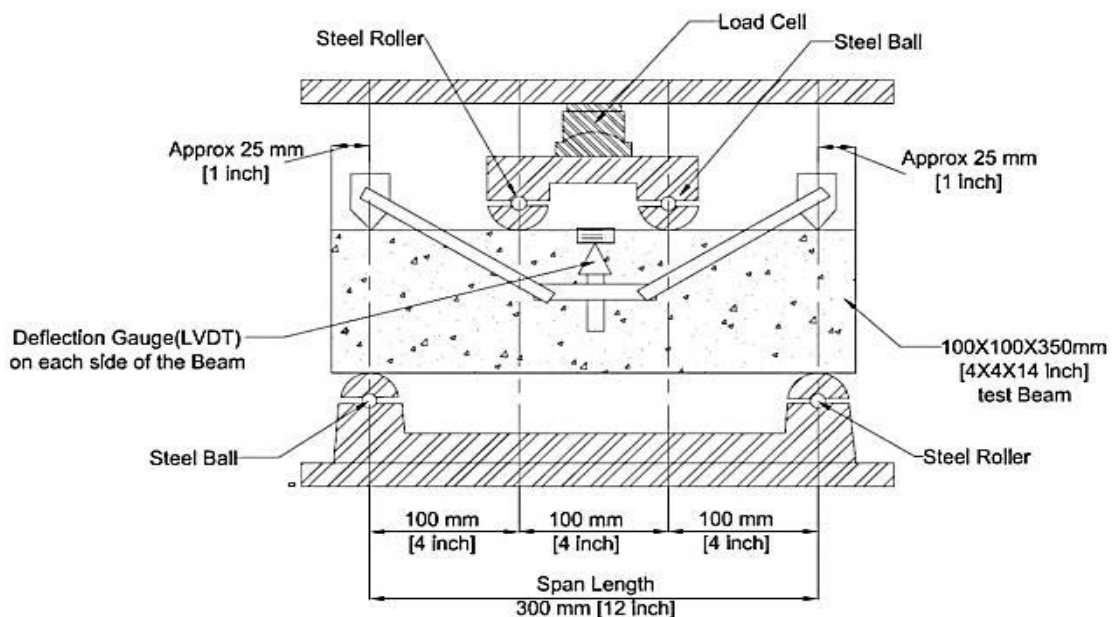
Typical arrangement of 3rd point bending test (ASTM C1609)
